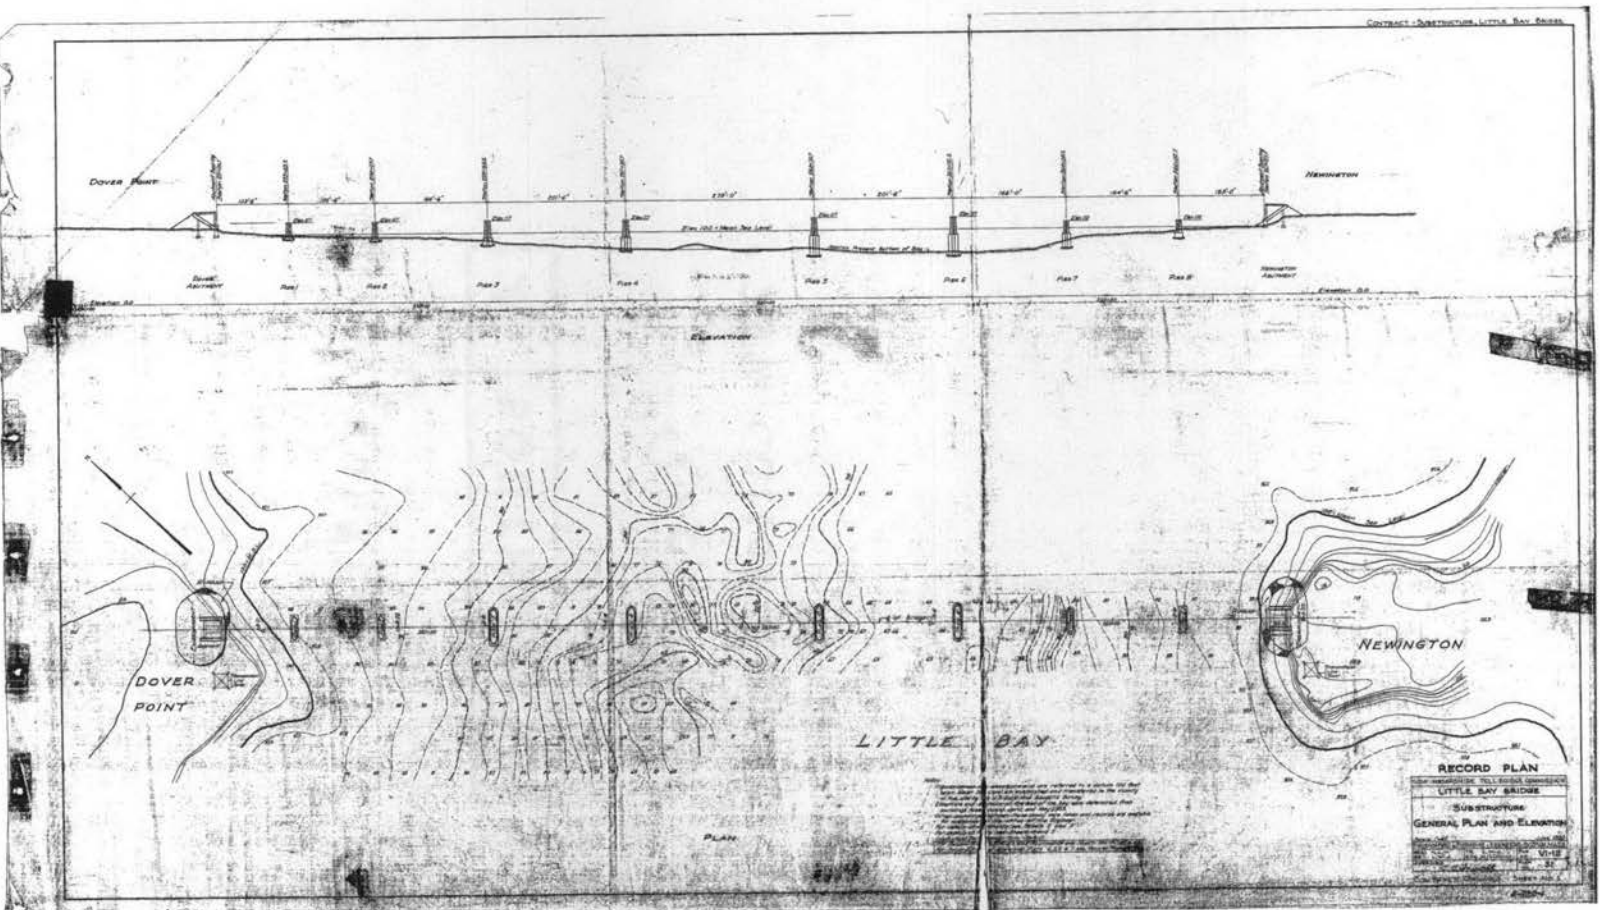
Record Plans, Substructure General Plan and Elevation, VI-12-31
